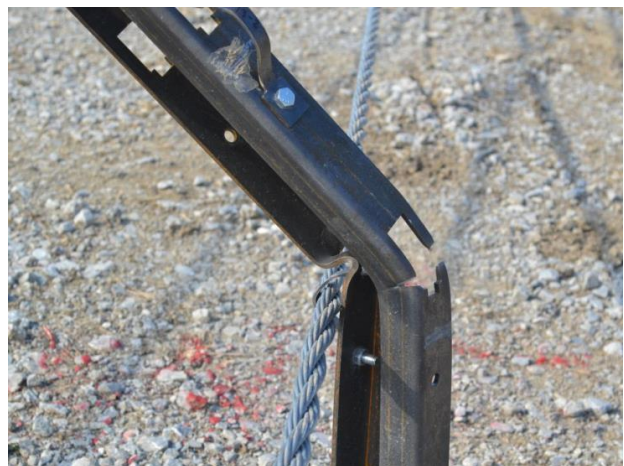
Damage to Lower Keyhole, Post Nos. 27 through 29, Test No. MWP-2
